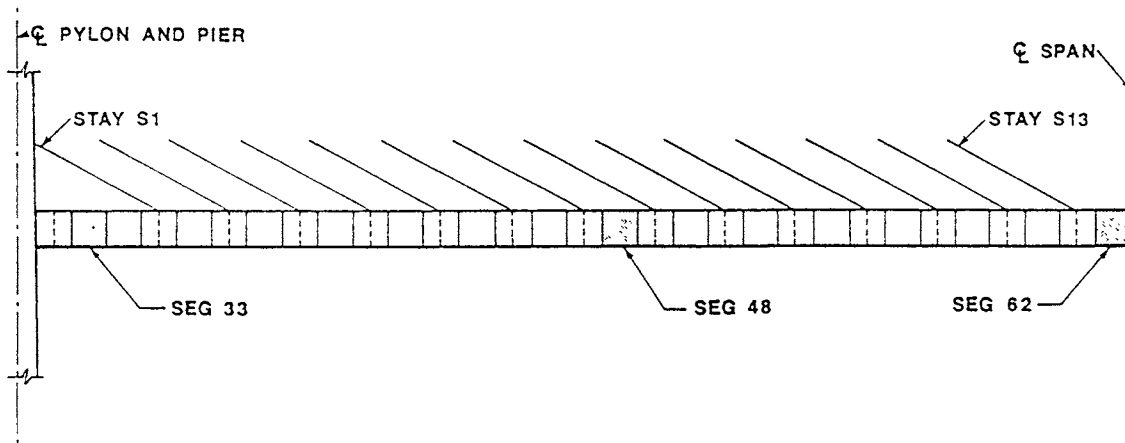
Location of Box Girder Segments Instrumented with Strain Gages.
